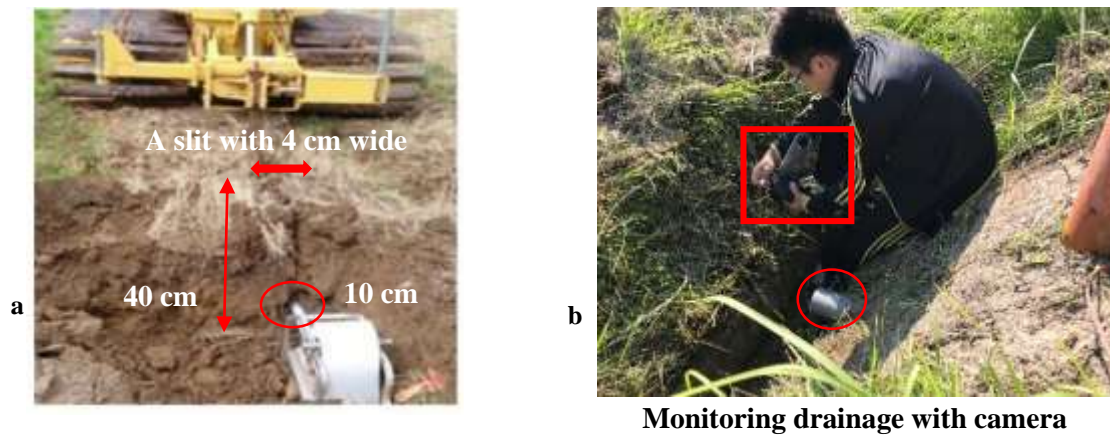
Installation of perforated sheet-pipe drains in a paddy field
